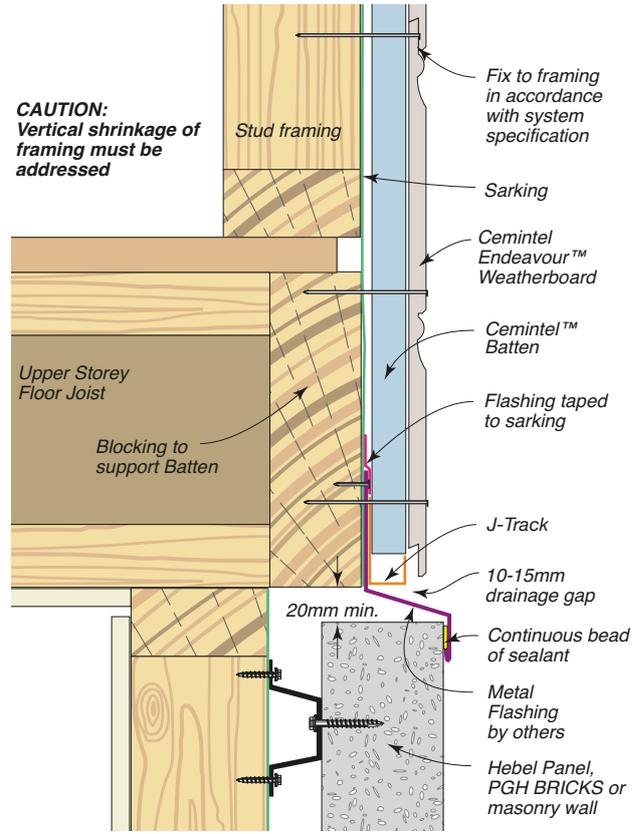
Second Storey Junction with Masonry, Brick Veneer or Hebel Panels
